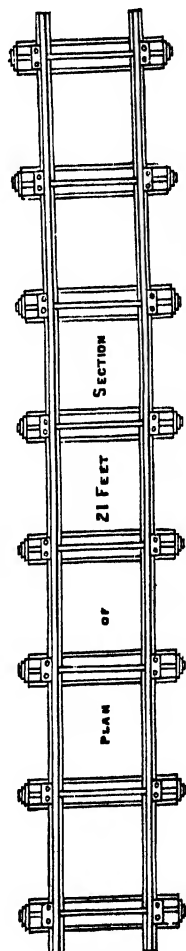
Light Permanent Steel Railway with Riveted Chairs (plan of line).
